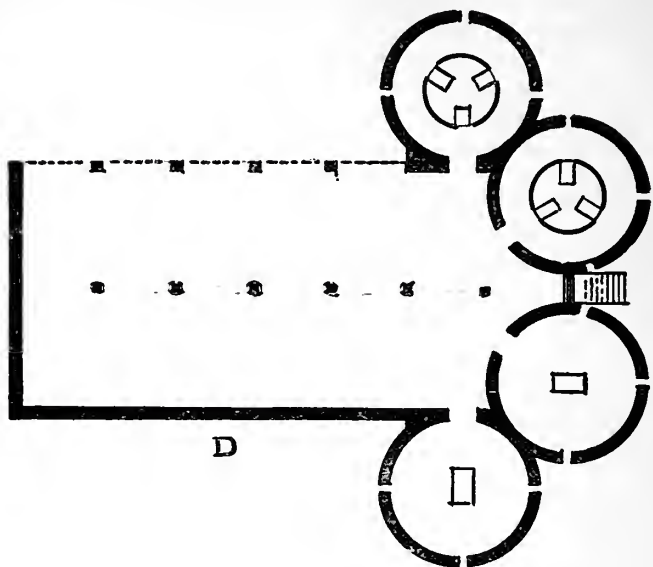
Ground Floor of Kilns and Cooling Room.
